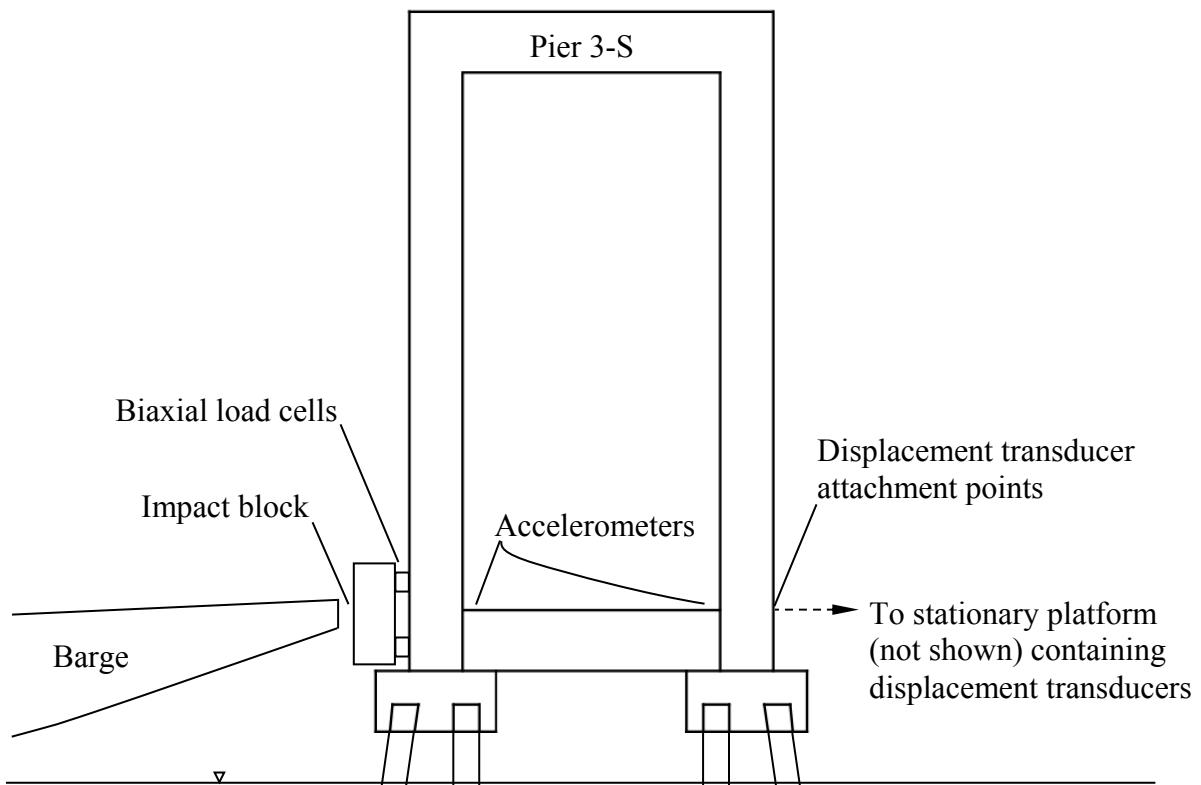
Schematic of test B3T4 at Pier 3-S (superstructure not shown)
